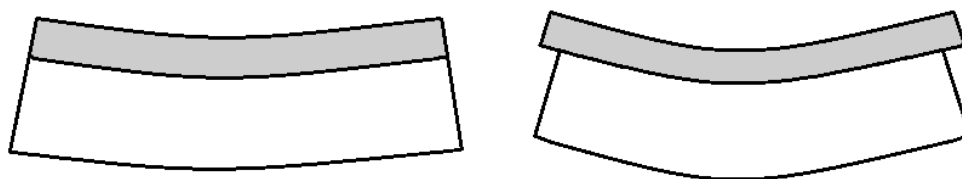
Bending of elements with a new layer of concrete, a) with full interaction and b) without interaction.
